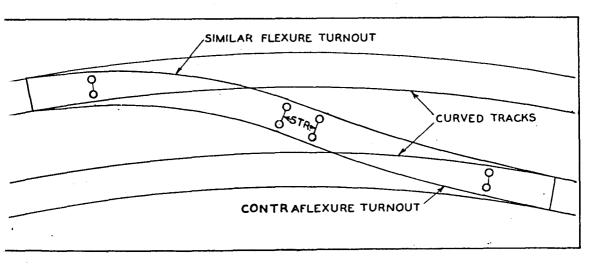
CROSSOVER USING CONTRA & SIMILAR FLEXURE TURNOUTS
